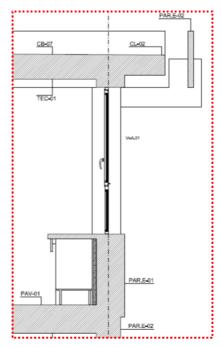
Façade section | Escola Secundária Mouzinho da Silveira (pre-existing build. e.g. C)
